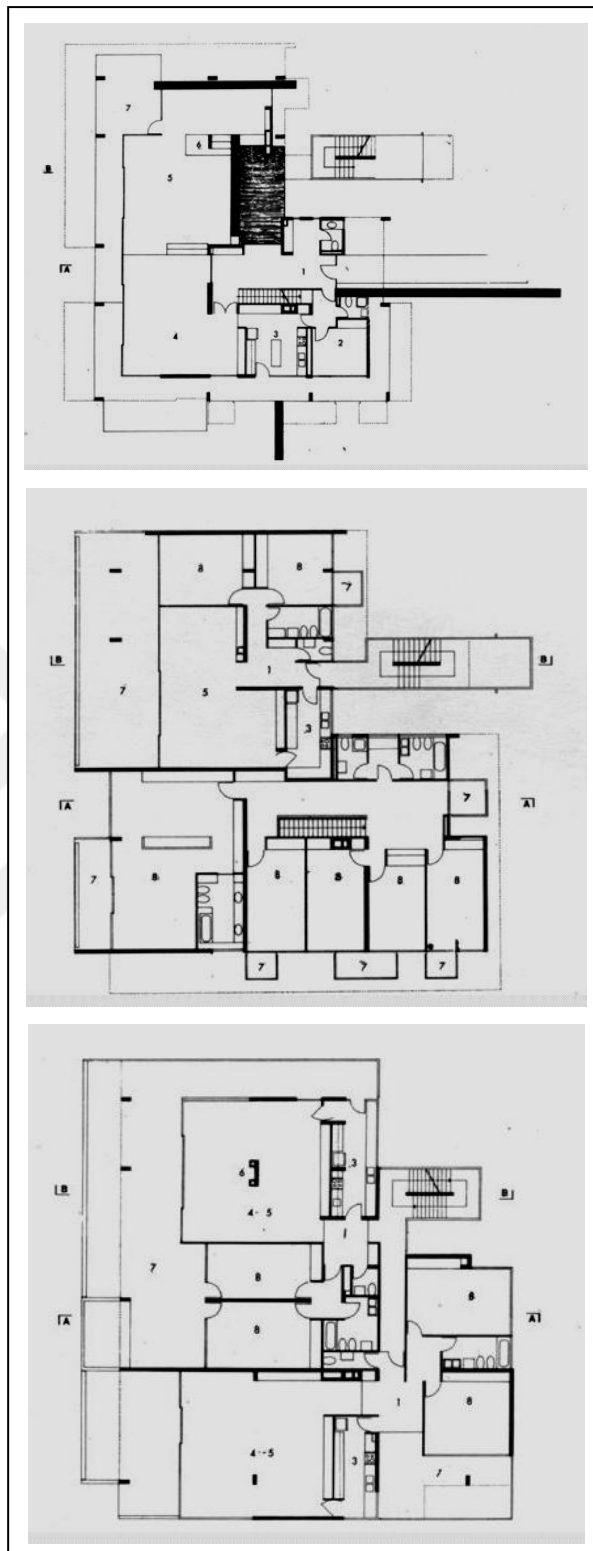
Floor plans of Ali Aksel house, 1972 [154]
